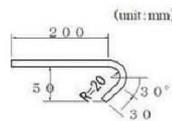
Shape of steel for fixing external form in case of using welded steel fabric
